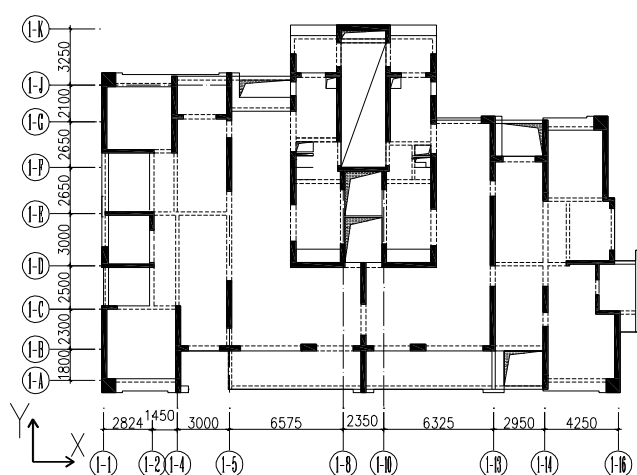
Standard floor plane of Huarun Yinhu lanshan residential compound.
